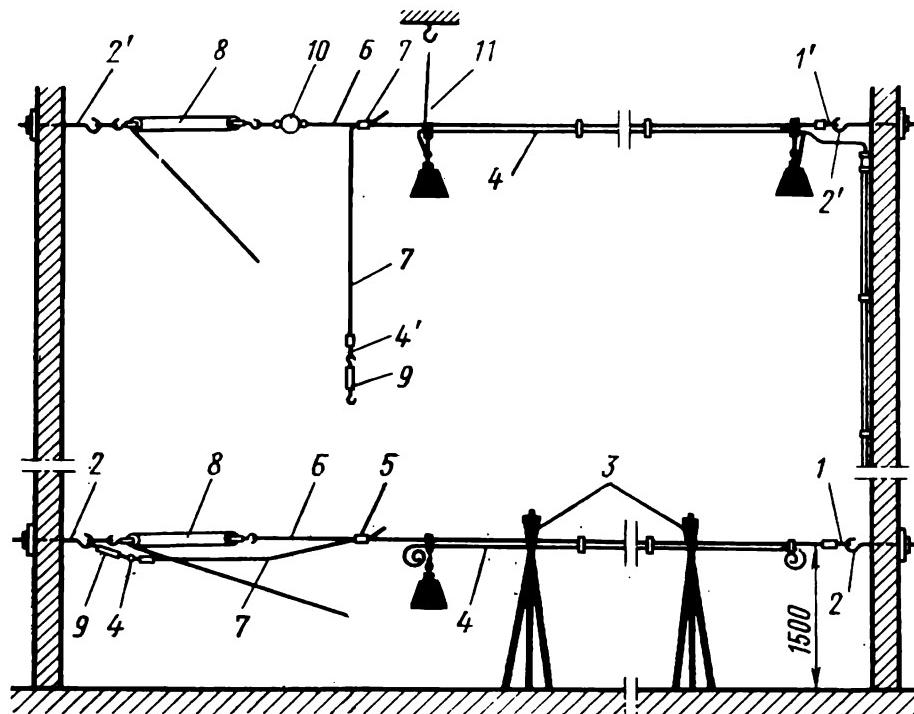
Assembling and securing a catenary wiring system on site of installation
